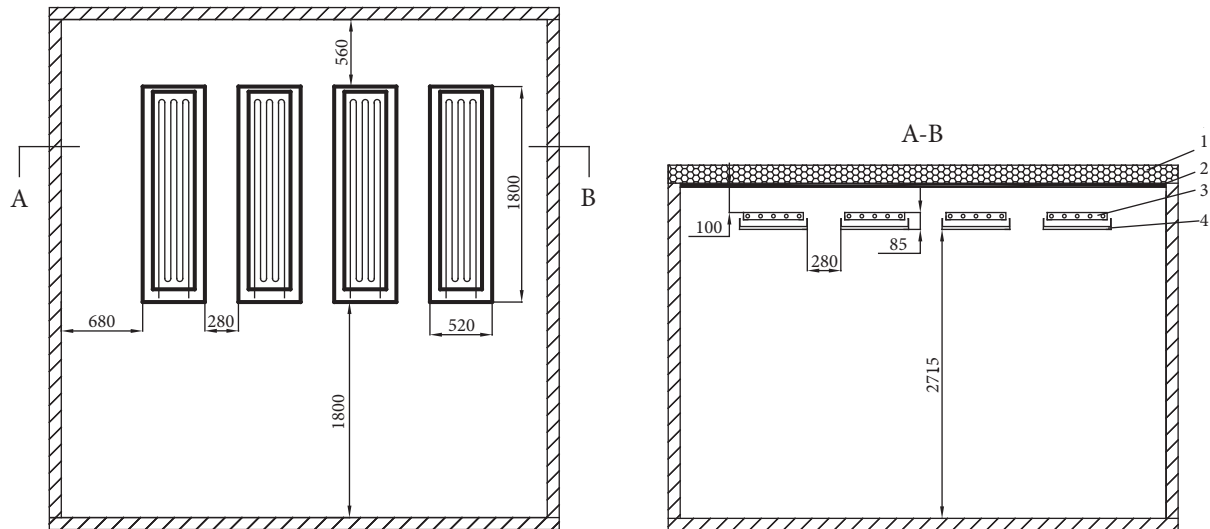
Plan and sectional view of radiant panel arrangement. 1 – thermal insulation layer, 2 – reflective layer, 3 – finned radiant plate, and 4 – groove-type shielding plate.
